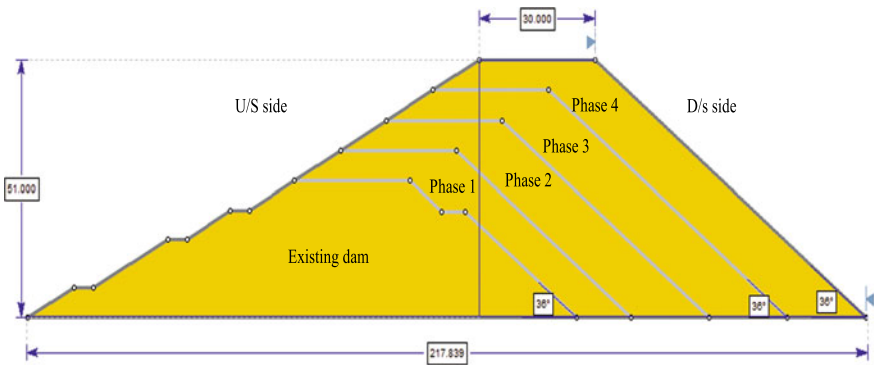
A typical cross-section of tailings dam at the end of construction using D/S method of construction
